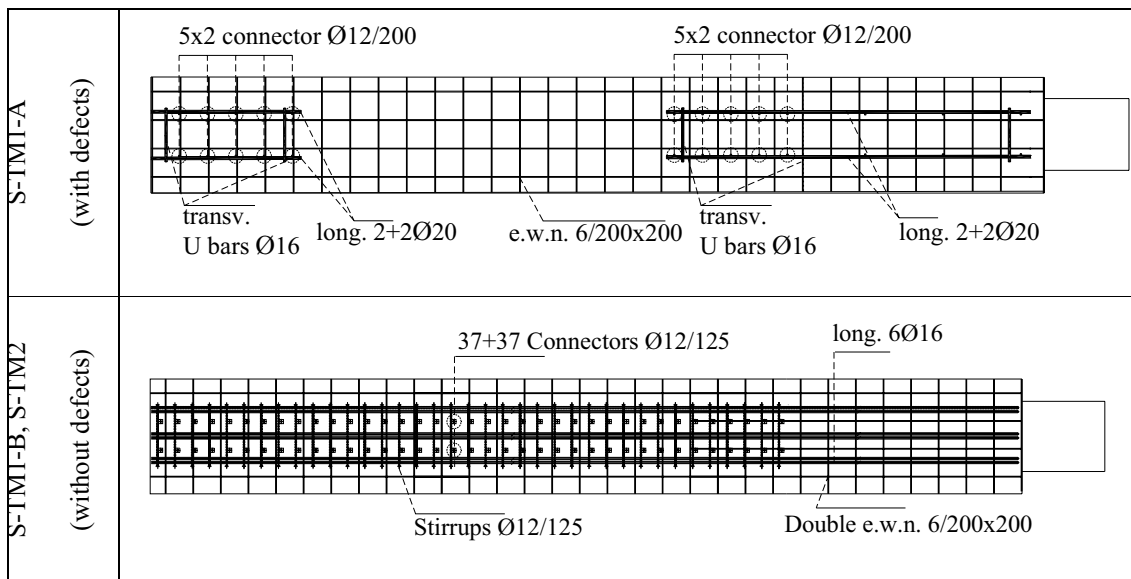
Retrofitted beams: RC slab steel reinforcement. Beam S-TM1-A (top); beams S-TM1-B and S-TM2 (bottom) (mm)
